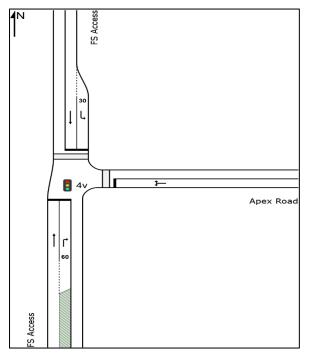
Intersection 4 Proposed Layout (Background Traffic)
